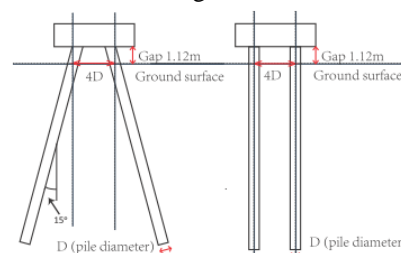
Spacing of piles in inclined pile and vertical pile groups (prototype scale).
